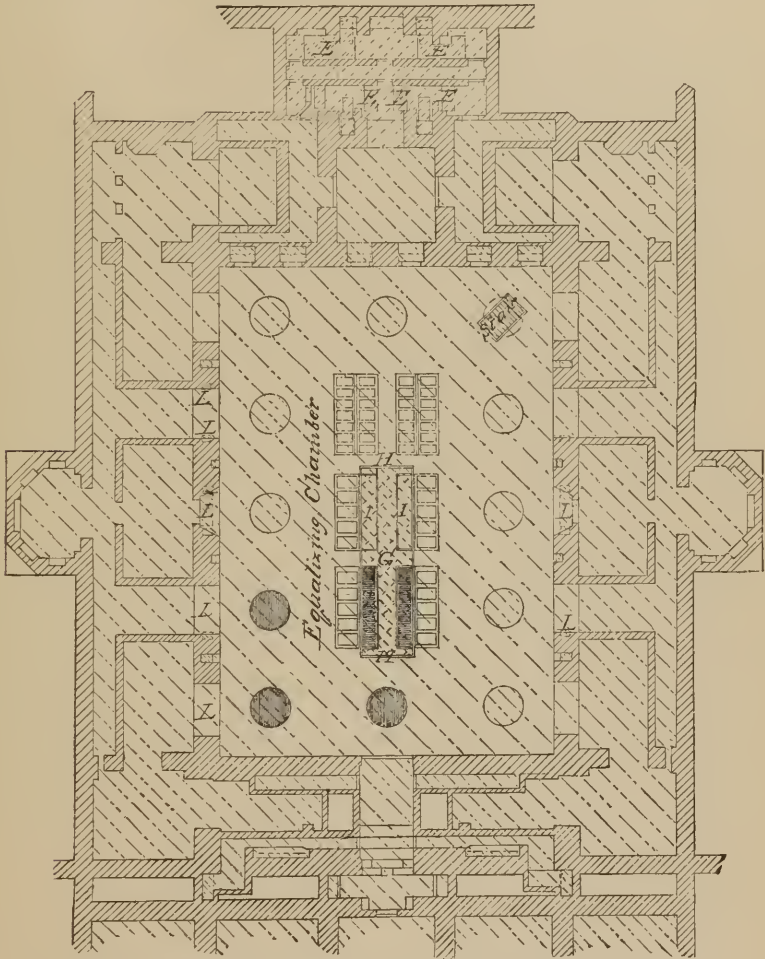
HORIZONTAL SECTION THROUGH HOUSE OF COMMONS.
